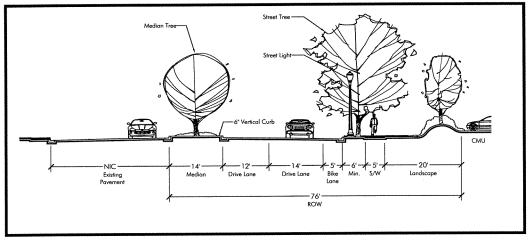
Arterial Road - Lathrop CMU Frontage, Section N
